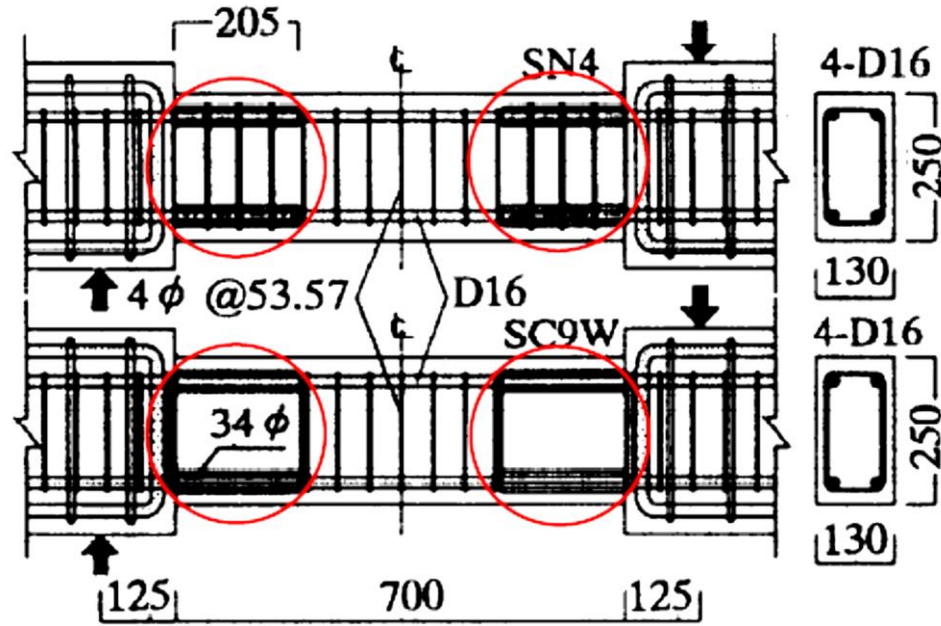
Specimen with Grouted Couplers Tested by Yoshino et al. (1996)
